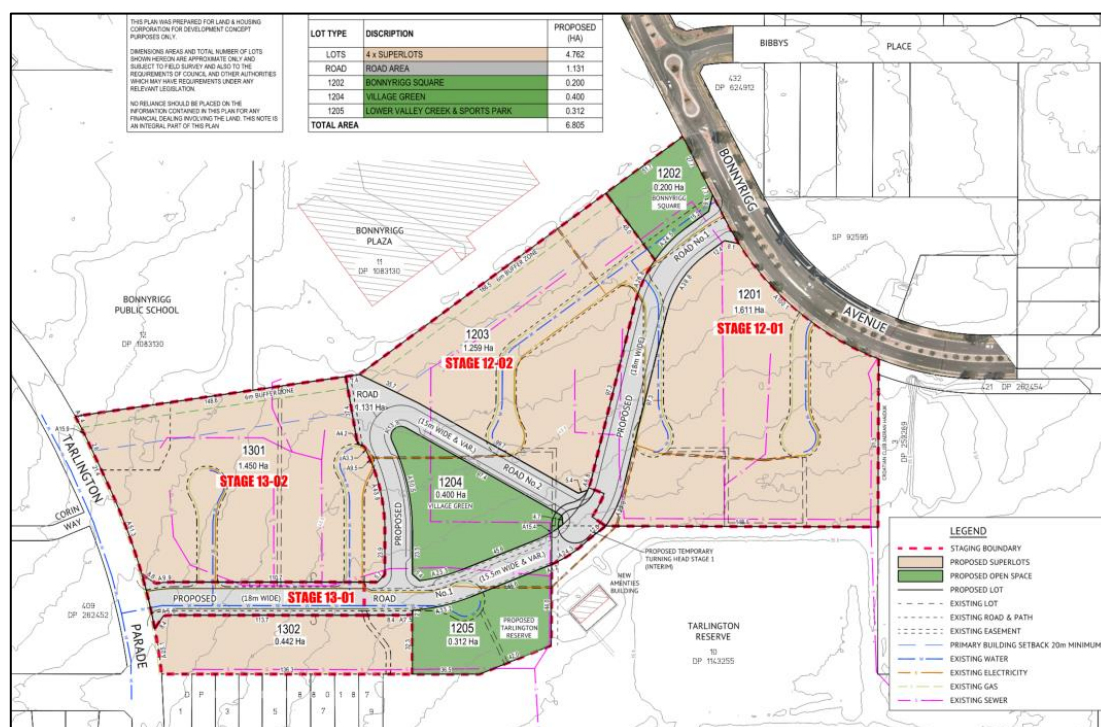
Proposed Staging Plan (Source: Premise, 2022)
